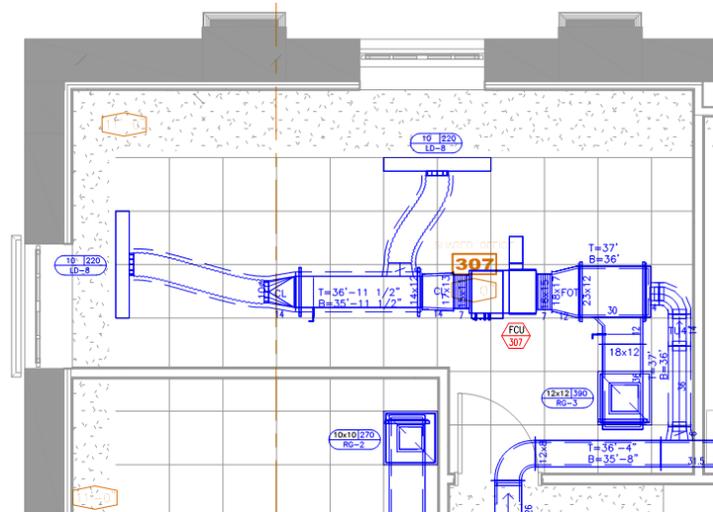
Air Conditioning system for a typical office space in the existing building. Image courtesy of Mascaro Construction Company.
